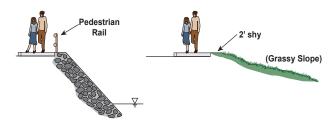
Pedestrian rail should be used when a sidewalk abuts a serious hazard
